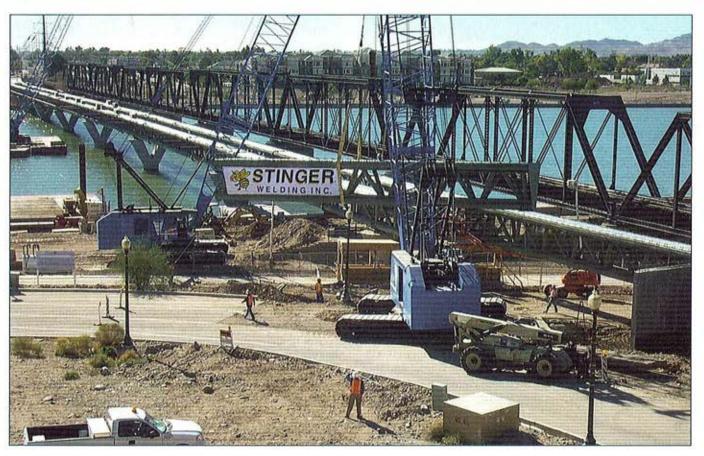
The bridge services the Phoenix, Ariz., light rail network and spans Tempe Town Lake. Here the last segment is being hoisted for setting at the northeast abutment. At right, parallel to the new bridge, is the historic 1912 single-track truss bridge that is still in use.
